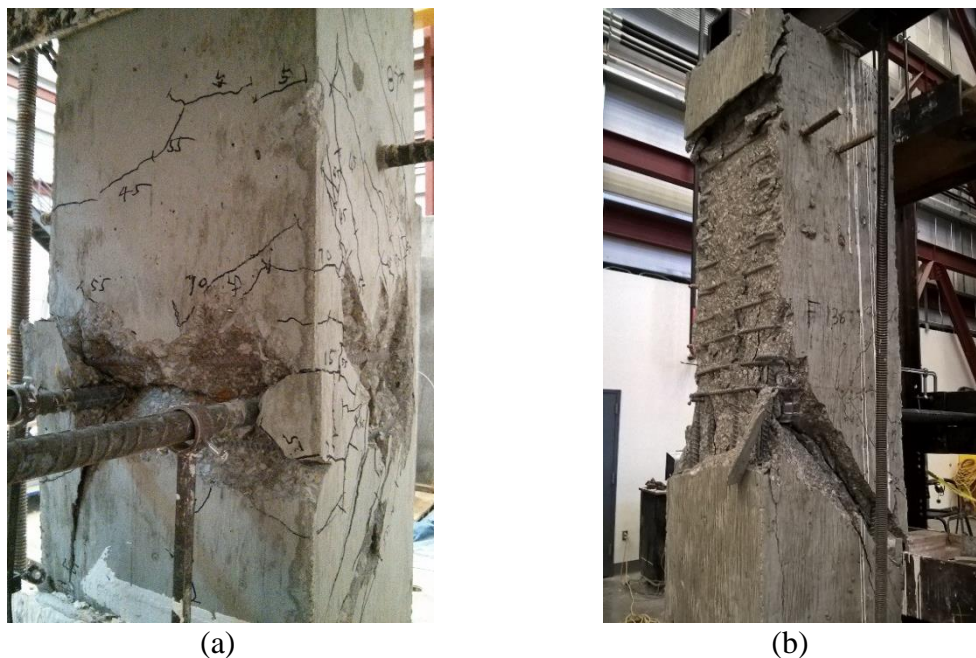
Secondary failure types (a) local front breakout, (b) back cover spalling
